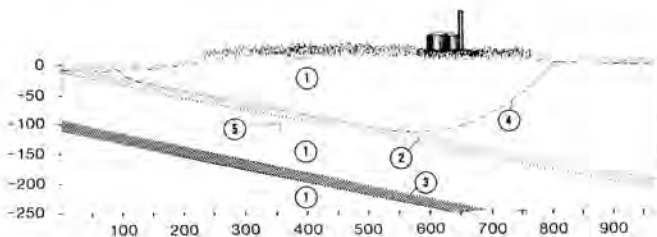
Planned location of LLW repository at Loviisa power plant site.
